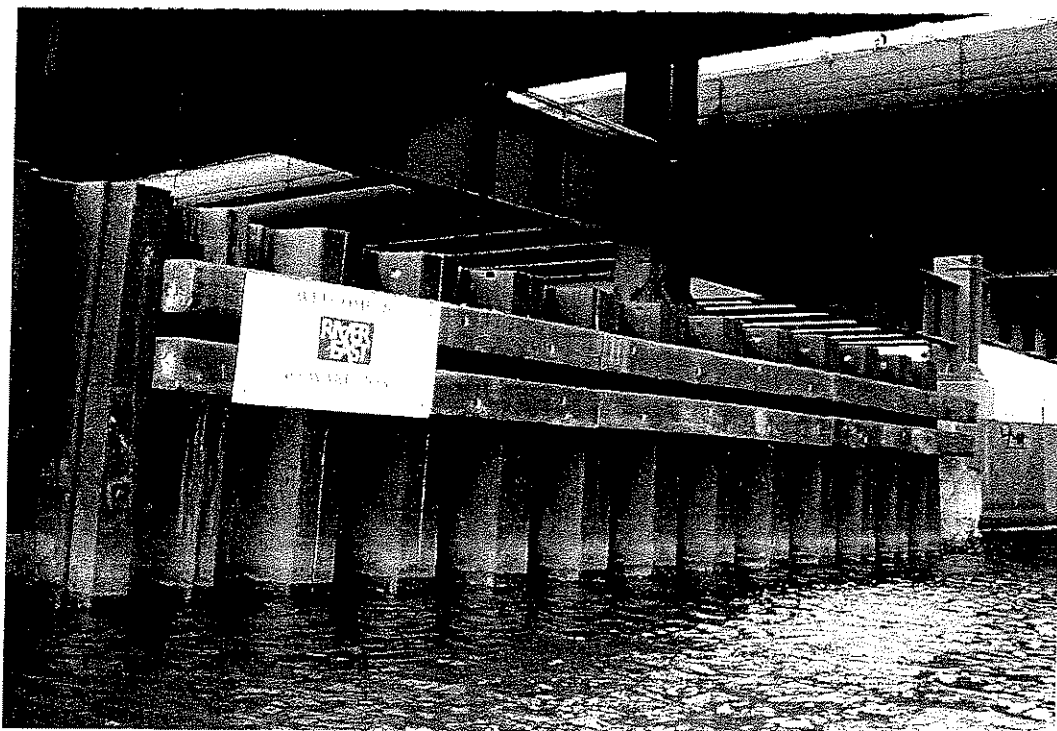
View of Typical Steel Condition, Looking Southwest from Station 9+40.
